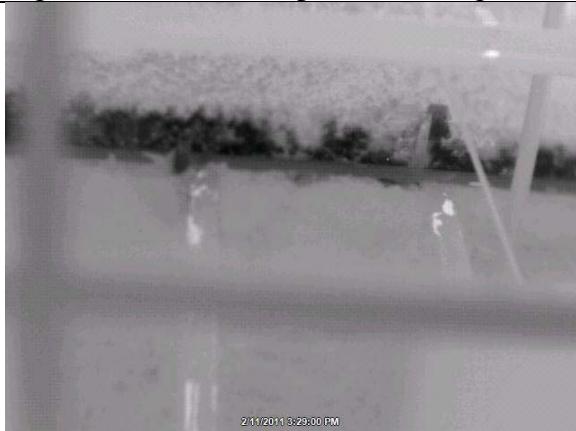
Another location showing air leakage through the fire lagging at the top of the garage demising wall.
